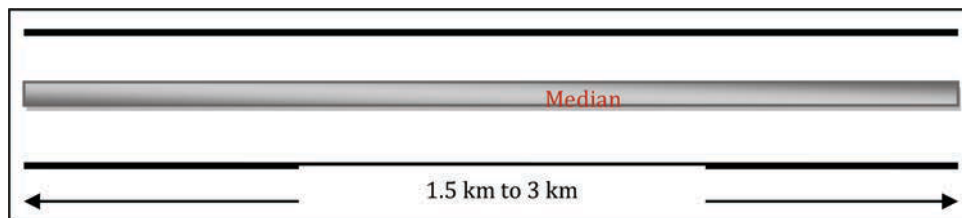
Typical Section of Urban Corridor of Uninterrupted flow section
